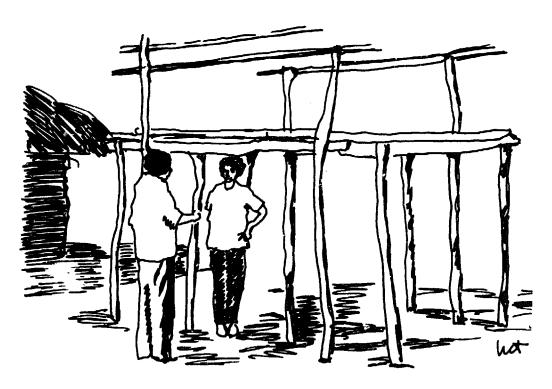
Traditional *Dungu* Construction showing separate supporting posts for platform and roof.
